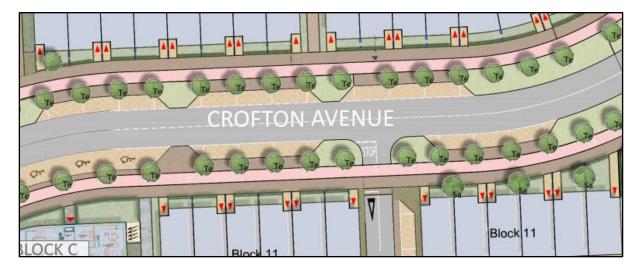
Extract from Park Hood Drawing 6473-L-304 illustrating the proposed link street named Crofton Avenue. Red arrows indicated entrances.
